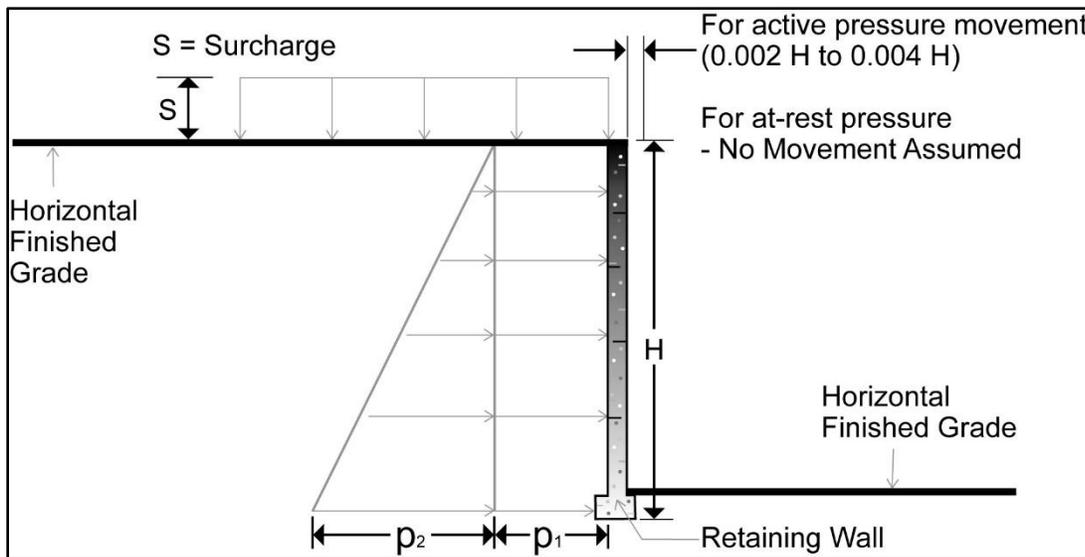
General Section Showing Pressures Acting on Retaining Walls
